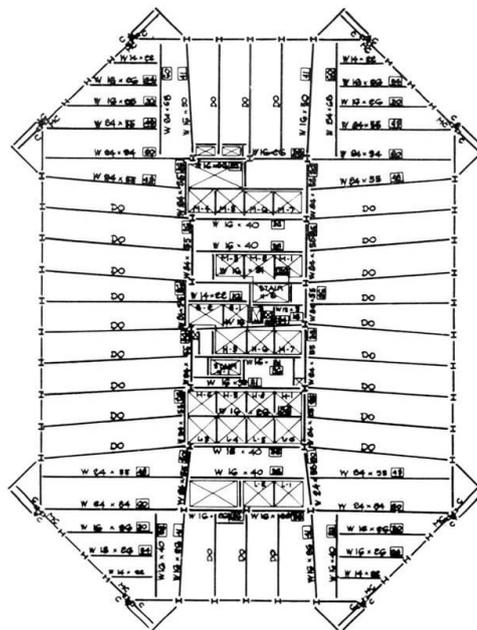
DRAVO BUILDING TYPICAL FLOOR
